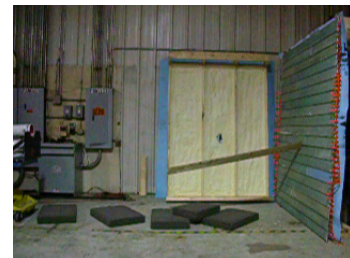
Wall 2 (Insulating Sheathing + Housewrap + 2" Closed Cell Spray Foam) fail at 50 fps
